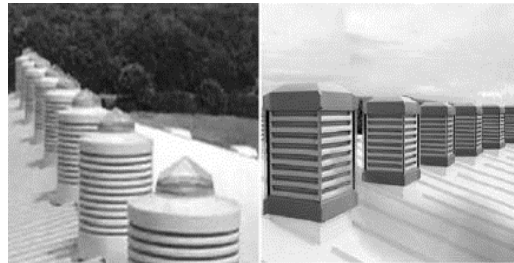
Using wind-catchers in modern buildings ventilation at consecutive arrangement
